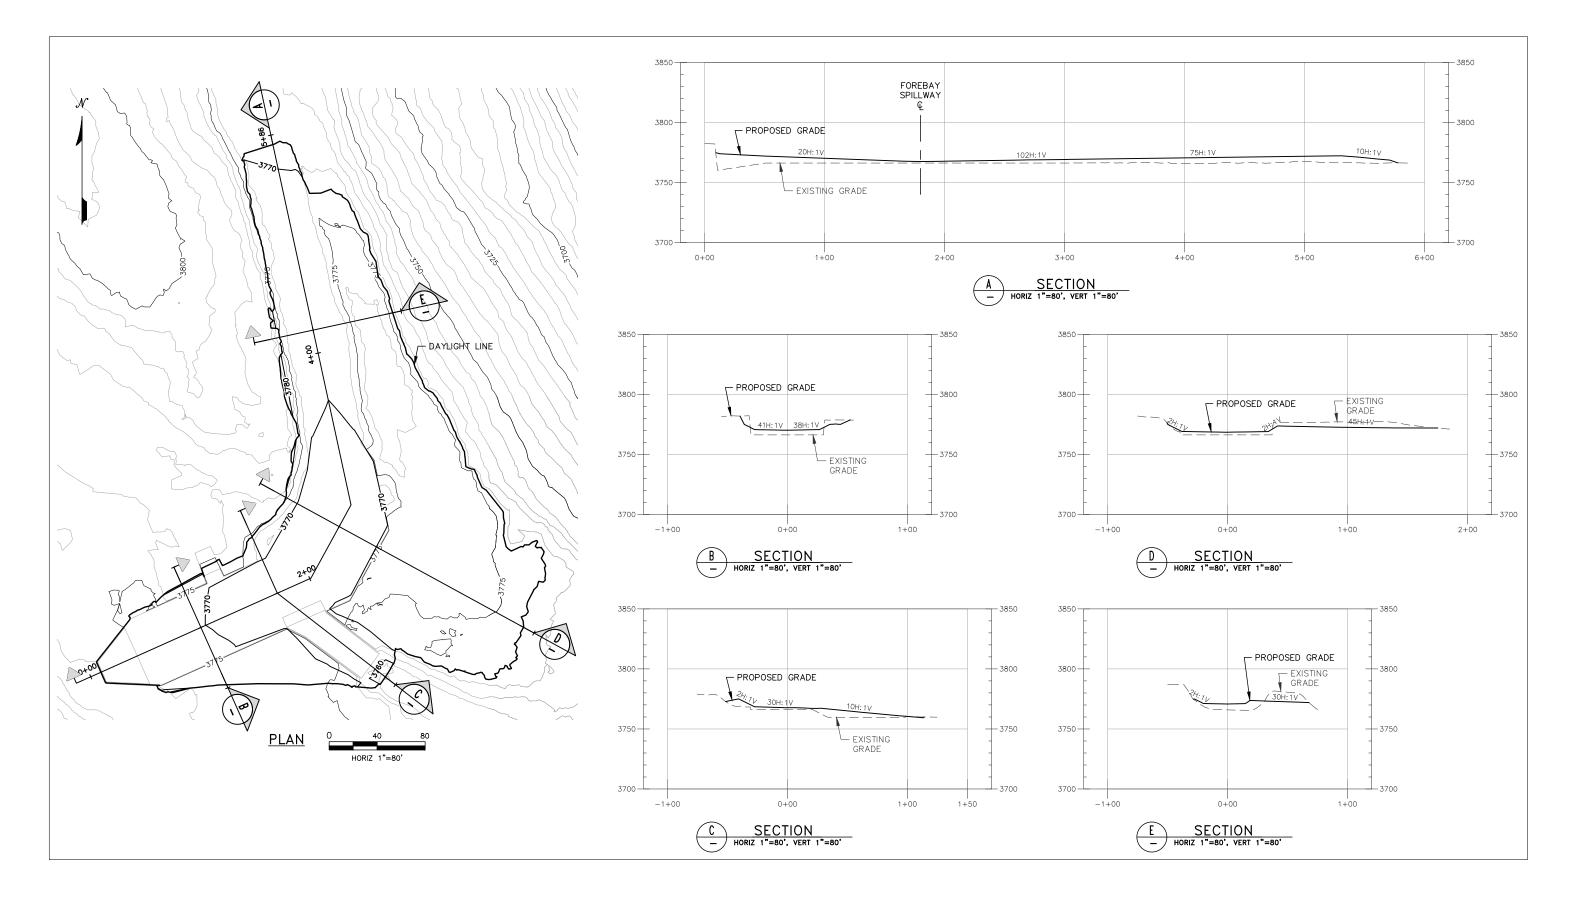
J.C. Boyle Forebay Backfill Plan & Sections
